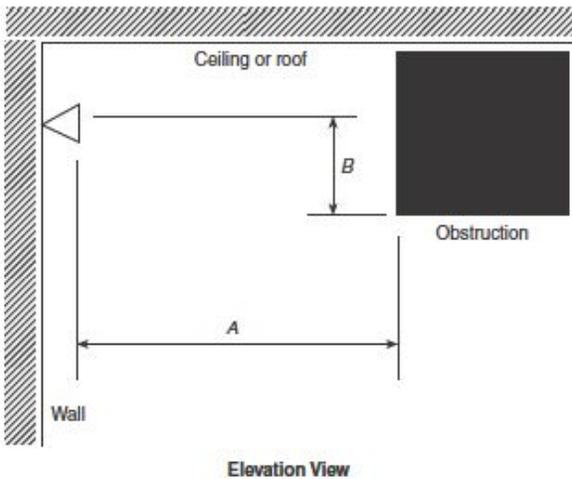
Positioning of Sprinklers to Avoid Obstructions (Standard Sidewall Spray Sprinklers).
